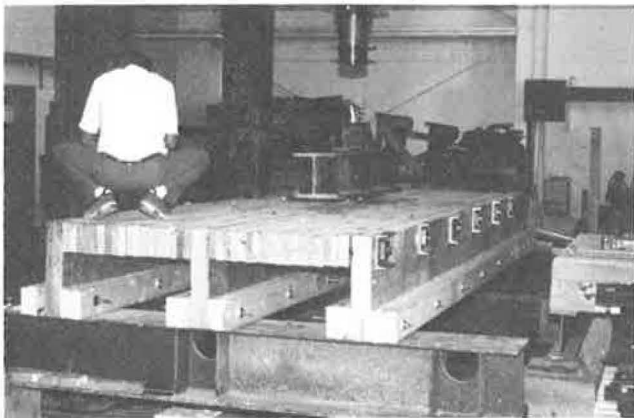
Stressed bulbed T-section model at West Virginia University, 16-ft span with 2- by 6-in. decking and 3- by 16-in. stringers.
